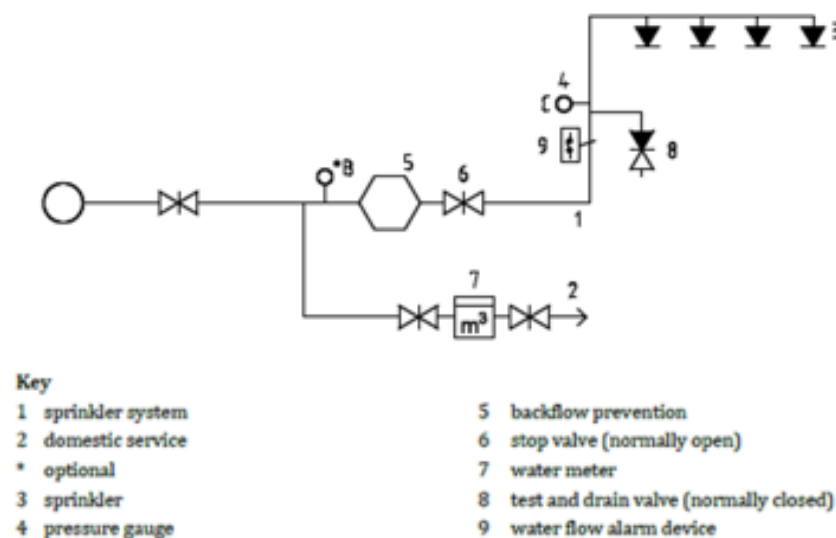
Typical arrangement for a mains fed sprinkler system with no pump (sprinkler systems only)
